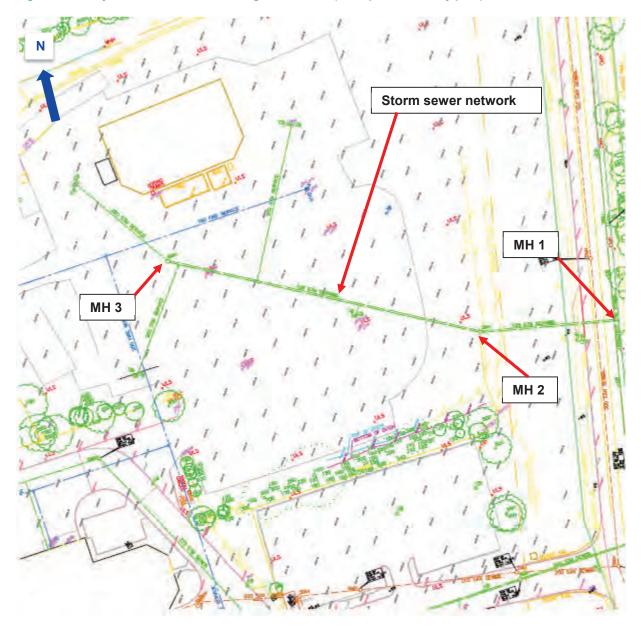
Layout of storm water drainage on the site (excerpt from survey plan)
